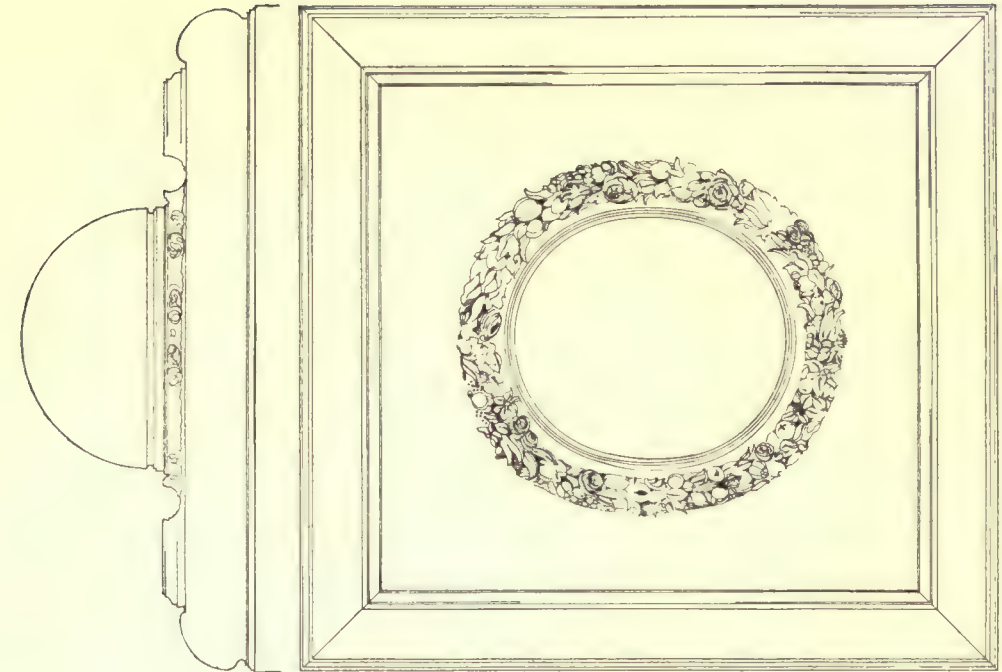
Ceiling of Small Room over Porch, off end of Gallery, Small Hall, Kirby Hall.
